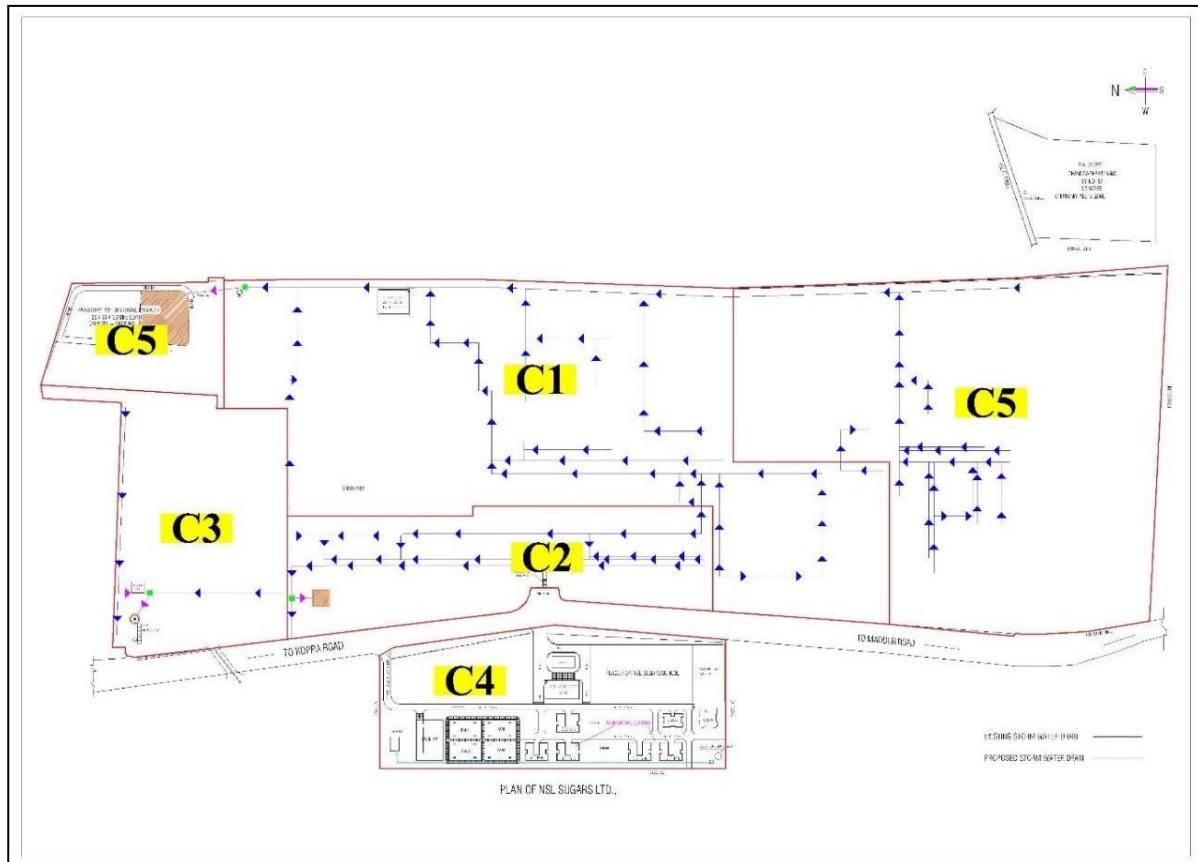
Existing and Proposed Storm Water Drains in NSL Sugars
